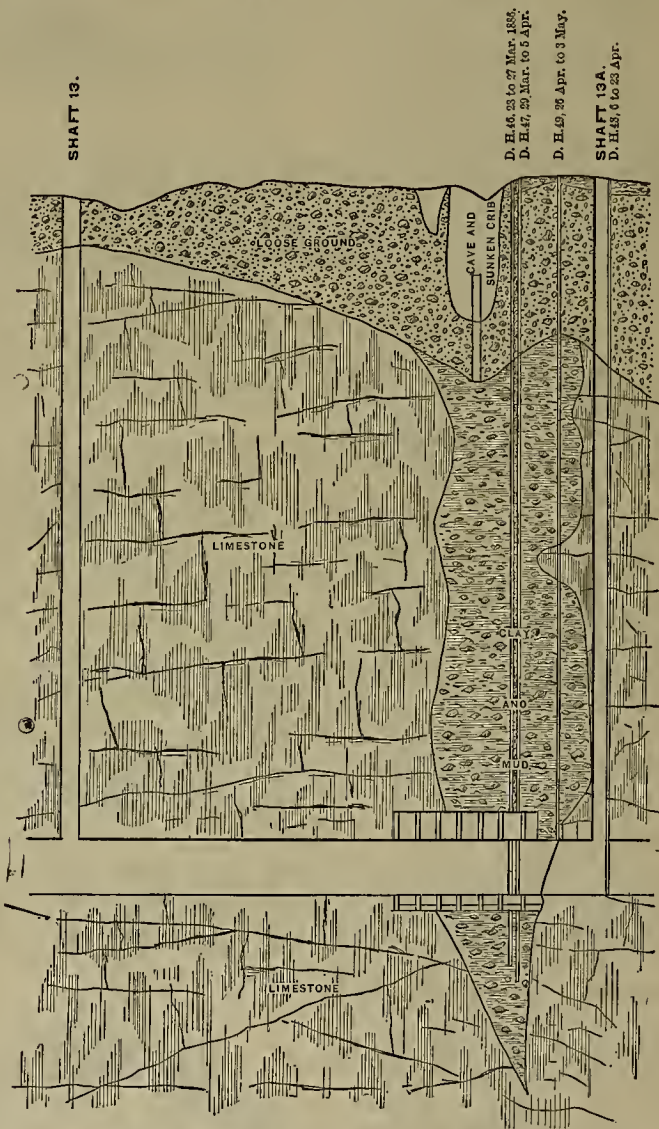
SECTION SHOWING BAD GROUND NEAR SHAFT 13A.
